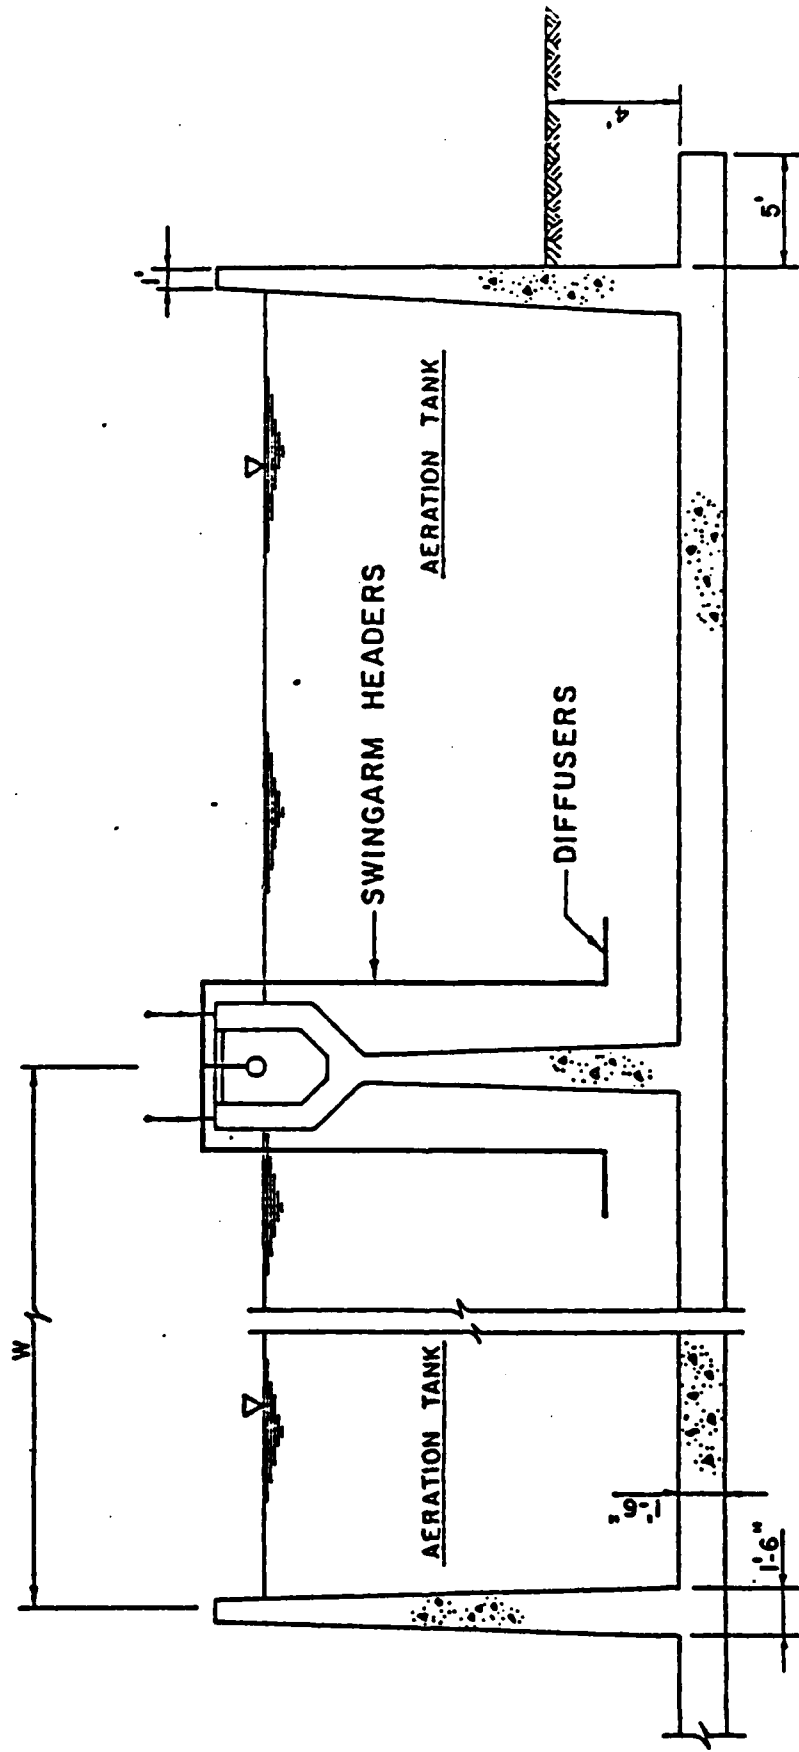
TYPICAL SECTION OF PLUG FLOW DIFFUSED AERATION TANKS
